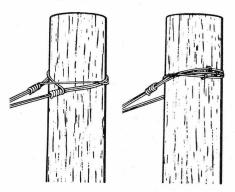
A common method of fastening tie wires in bracing assemblies is to loop the wire around brace or corner posts and secure the loop with a short piece of wire in the manner illustrated (left, front view; right, back view). The wires are sometimes wrapped completely around the post.
